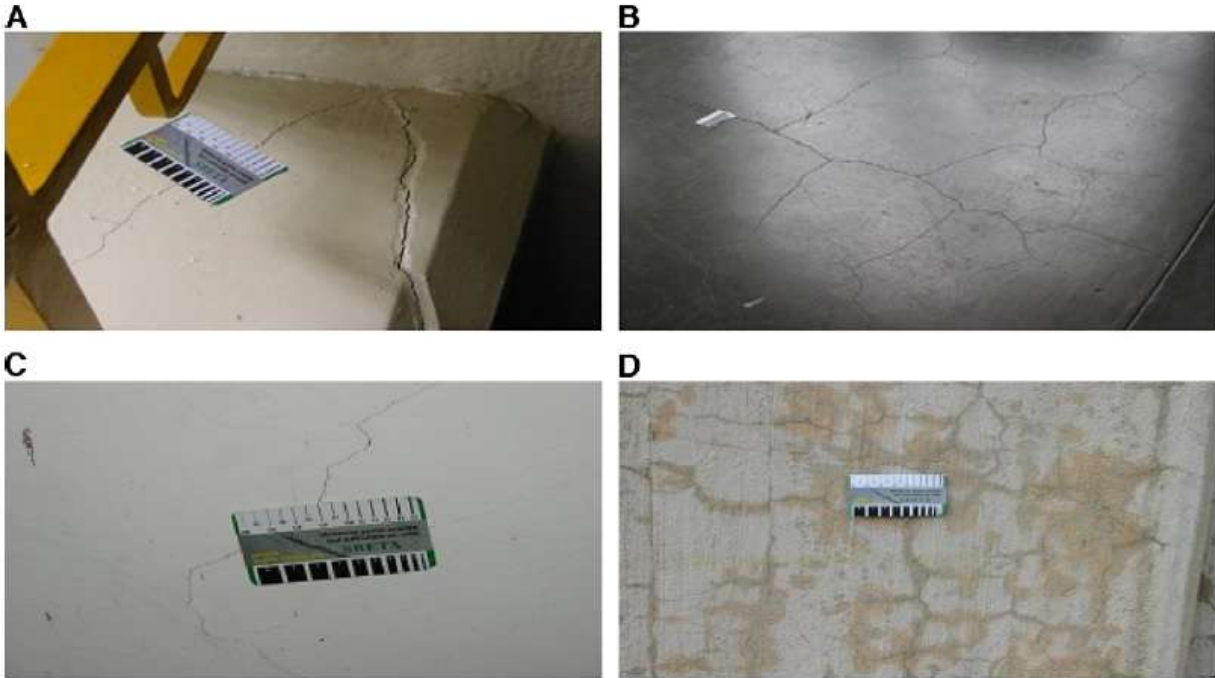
(A) Cracking at the beam of the assembly bay. (B) Crack pattern in the second slab in front of the Roll-a-door of the assembly bay. (C) Cracking observed on the staircase wall on the floor below the assembly bay floor. (D) Map-cracking pattern of an exterior column of the power station. Similar cracking is also present on the exterior wall.
